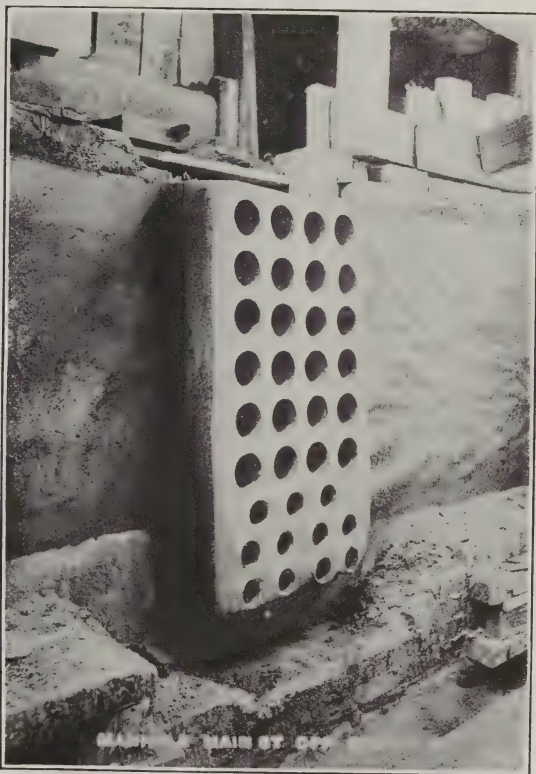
Waterproofing on Wall of Manhole and Seal around Fiber Ducts
